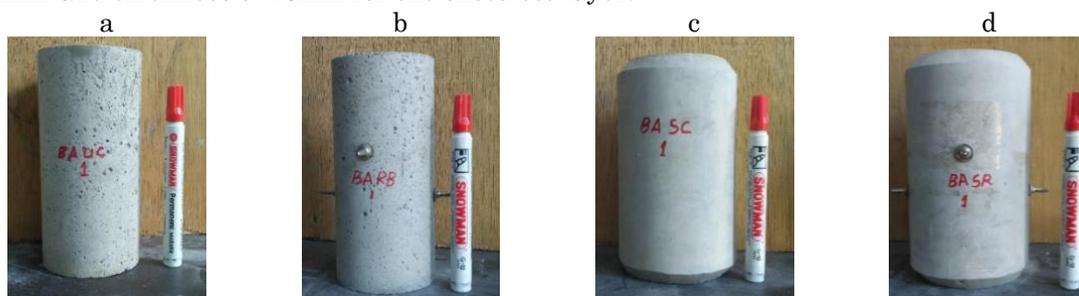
Pillar Physical Models (a. Pillar without reinforcement, b. Pillar with rock bolt reinforcement, c. Pillar with shotcrete reinforcement, d. Pillar with combination of rock bolt and shotcrete reinforcement)
